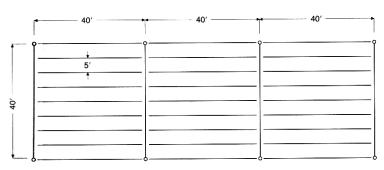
Framing plan for joists, girders, and columns on 40 ft \times 40 ft grid.
